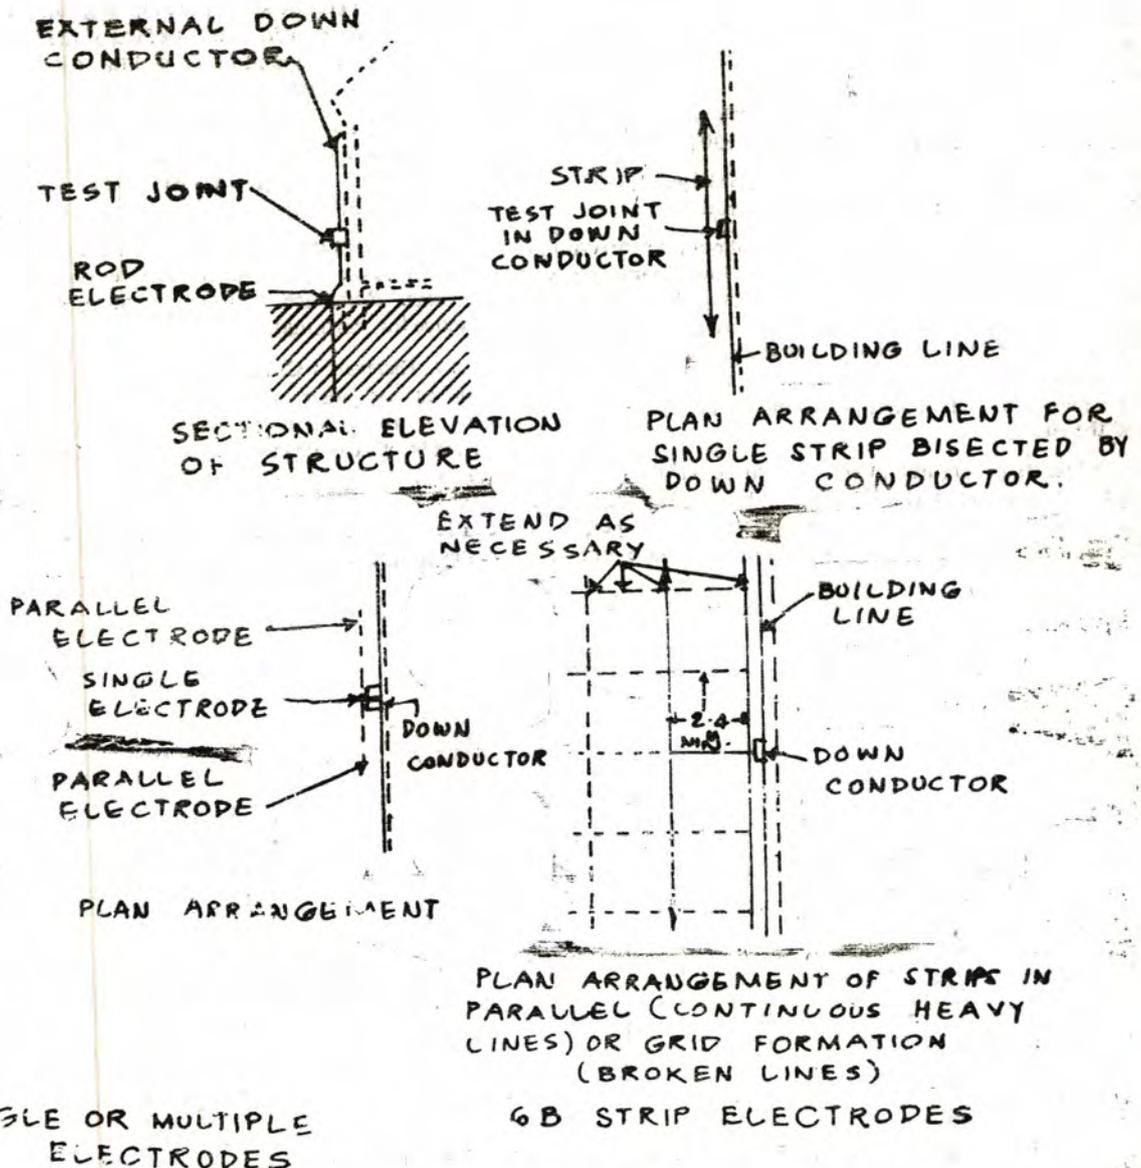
ARRANGEMENT FOR EARTH ELECTRODES
